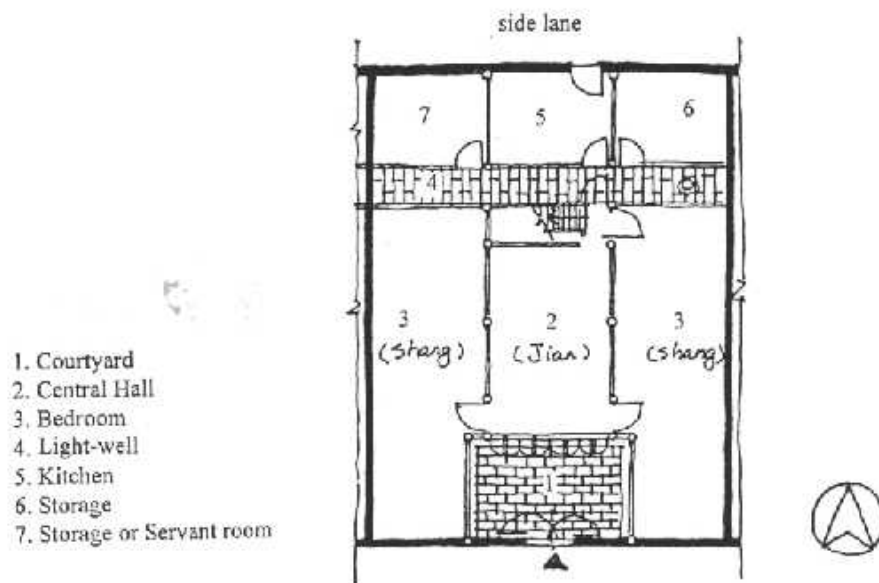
Plan of an Old Shi-ku-men Lilong House (in one-jian and two-shang pattern)
